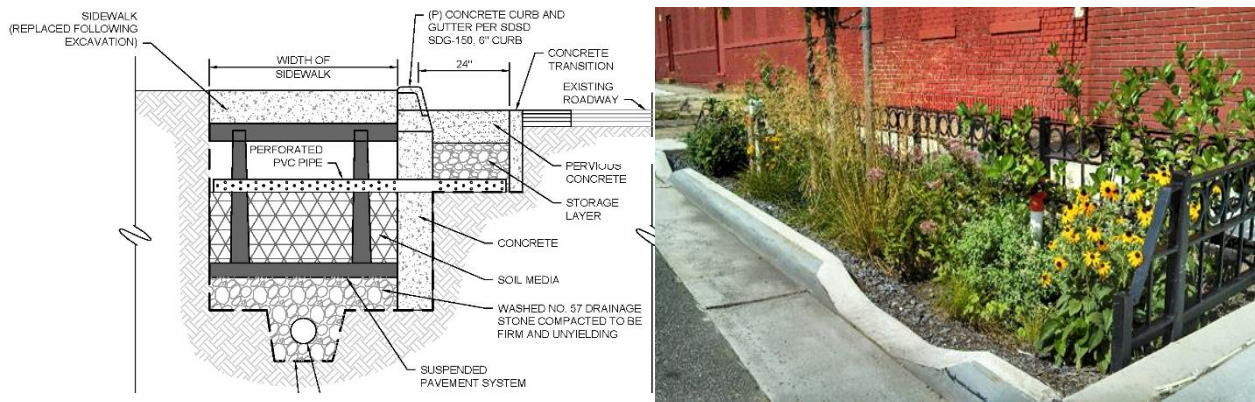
Suspended sidewalk system (left) and bioretention in the Right-of-Way (right).
